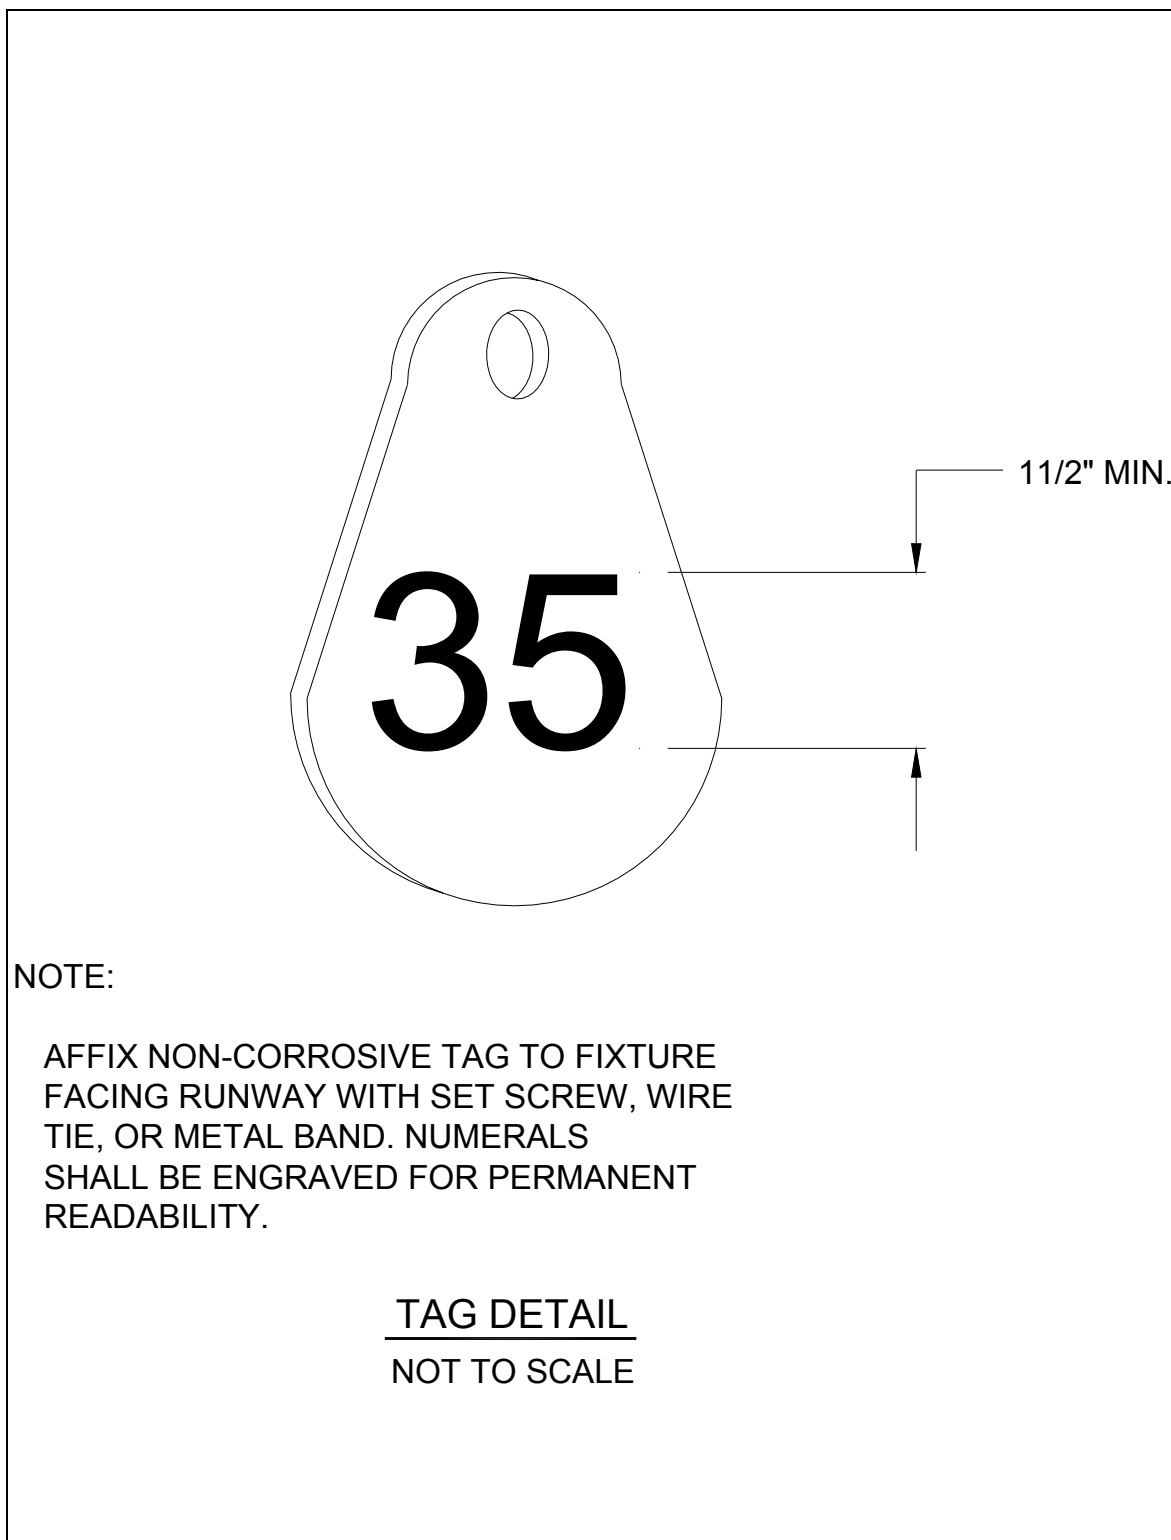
Typical Standard Details for Runway and Taxiway Edge Lights – GL-600 Sheet 1E – Tag Detail
